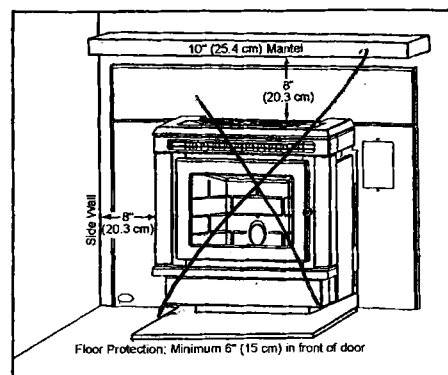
EF Fireplace Insert Clearance to Combustibles.
